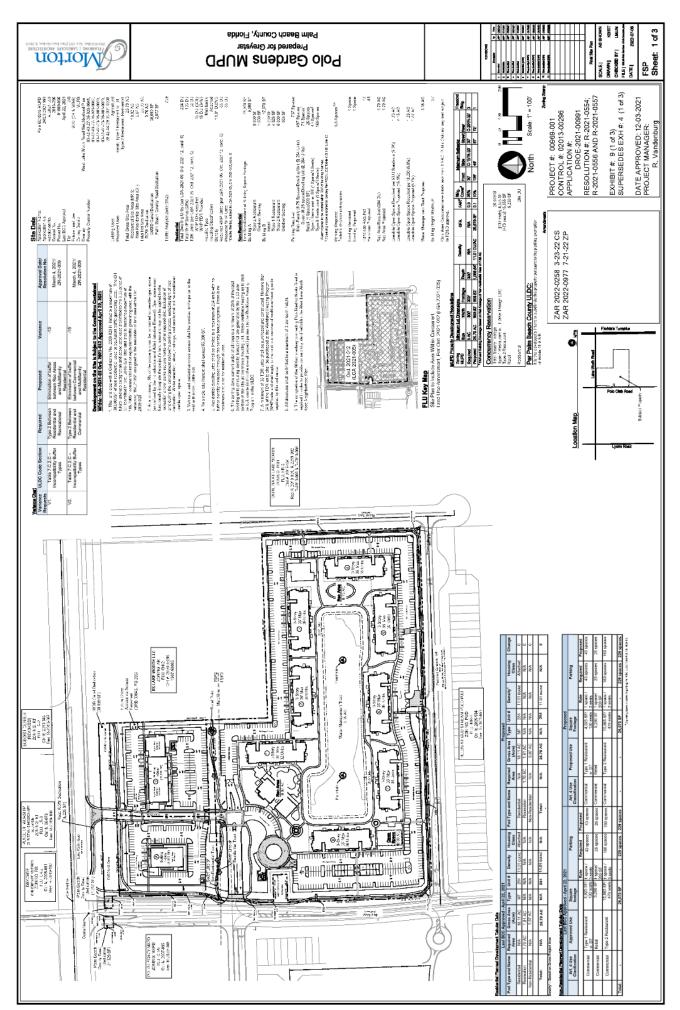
Preliminary Site Plan Dated January 23, 2023 (Page 3 of 3)
